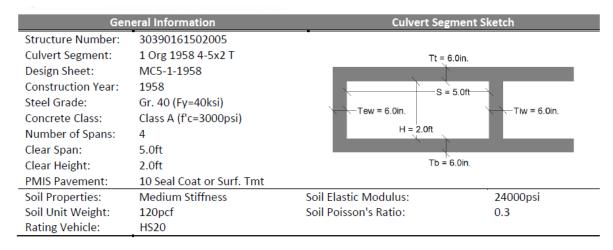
Culvert No. 30390161502005; General Information and Segment Sketch
